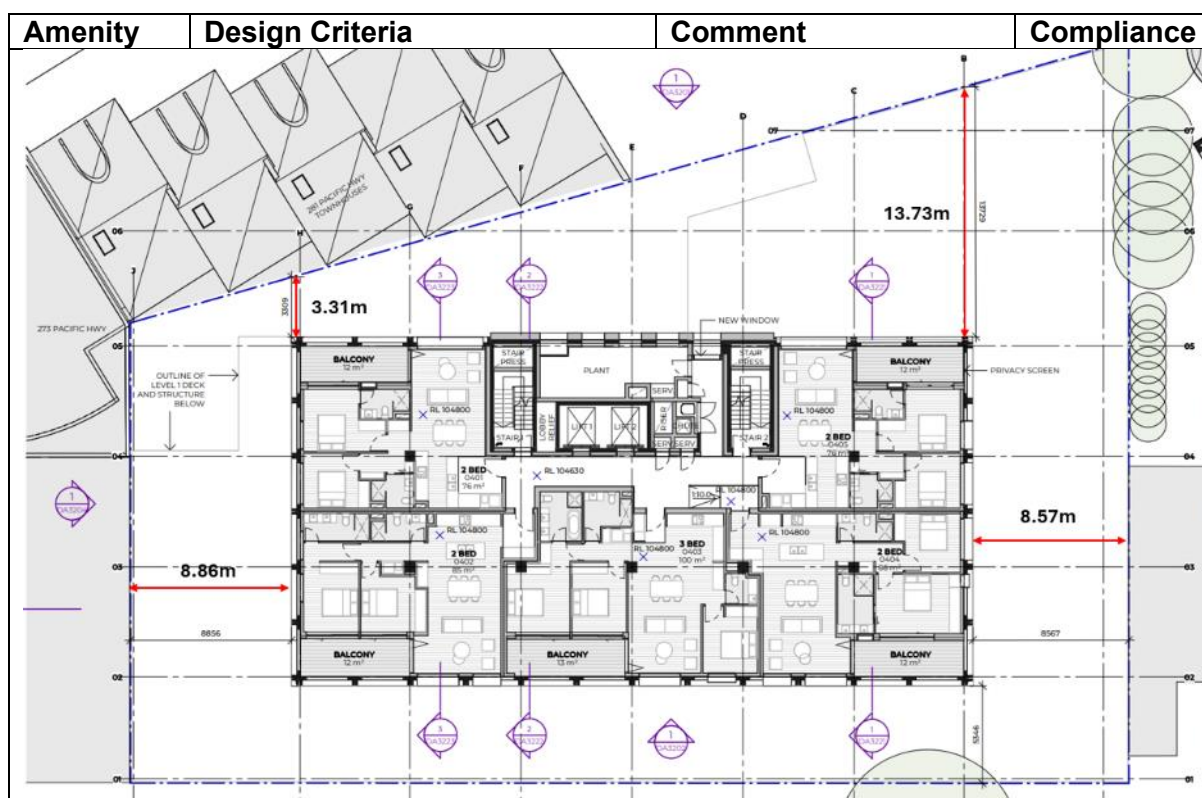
Annotated Proposed Level 04 Floor Plan (Typical L02-L09), Dwg No. DA2205 Rev A
